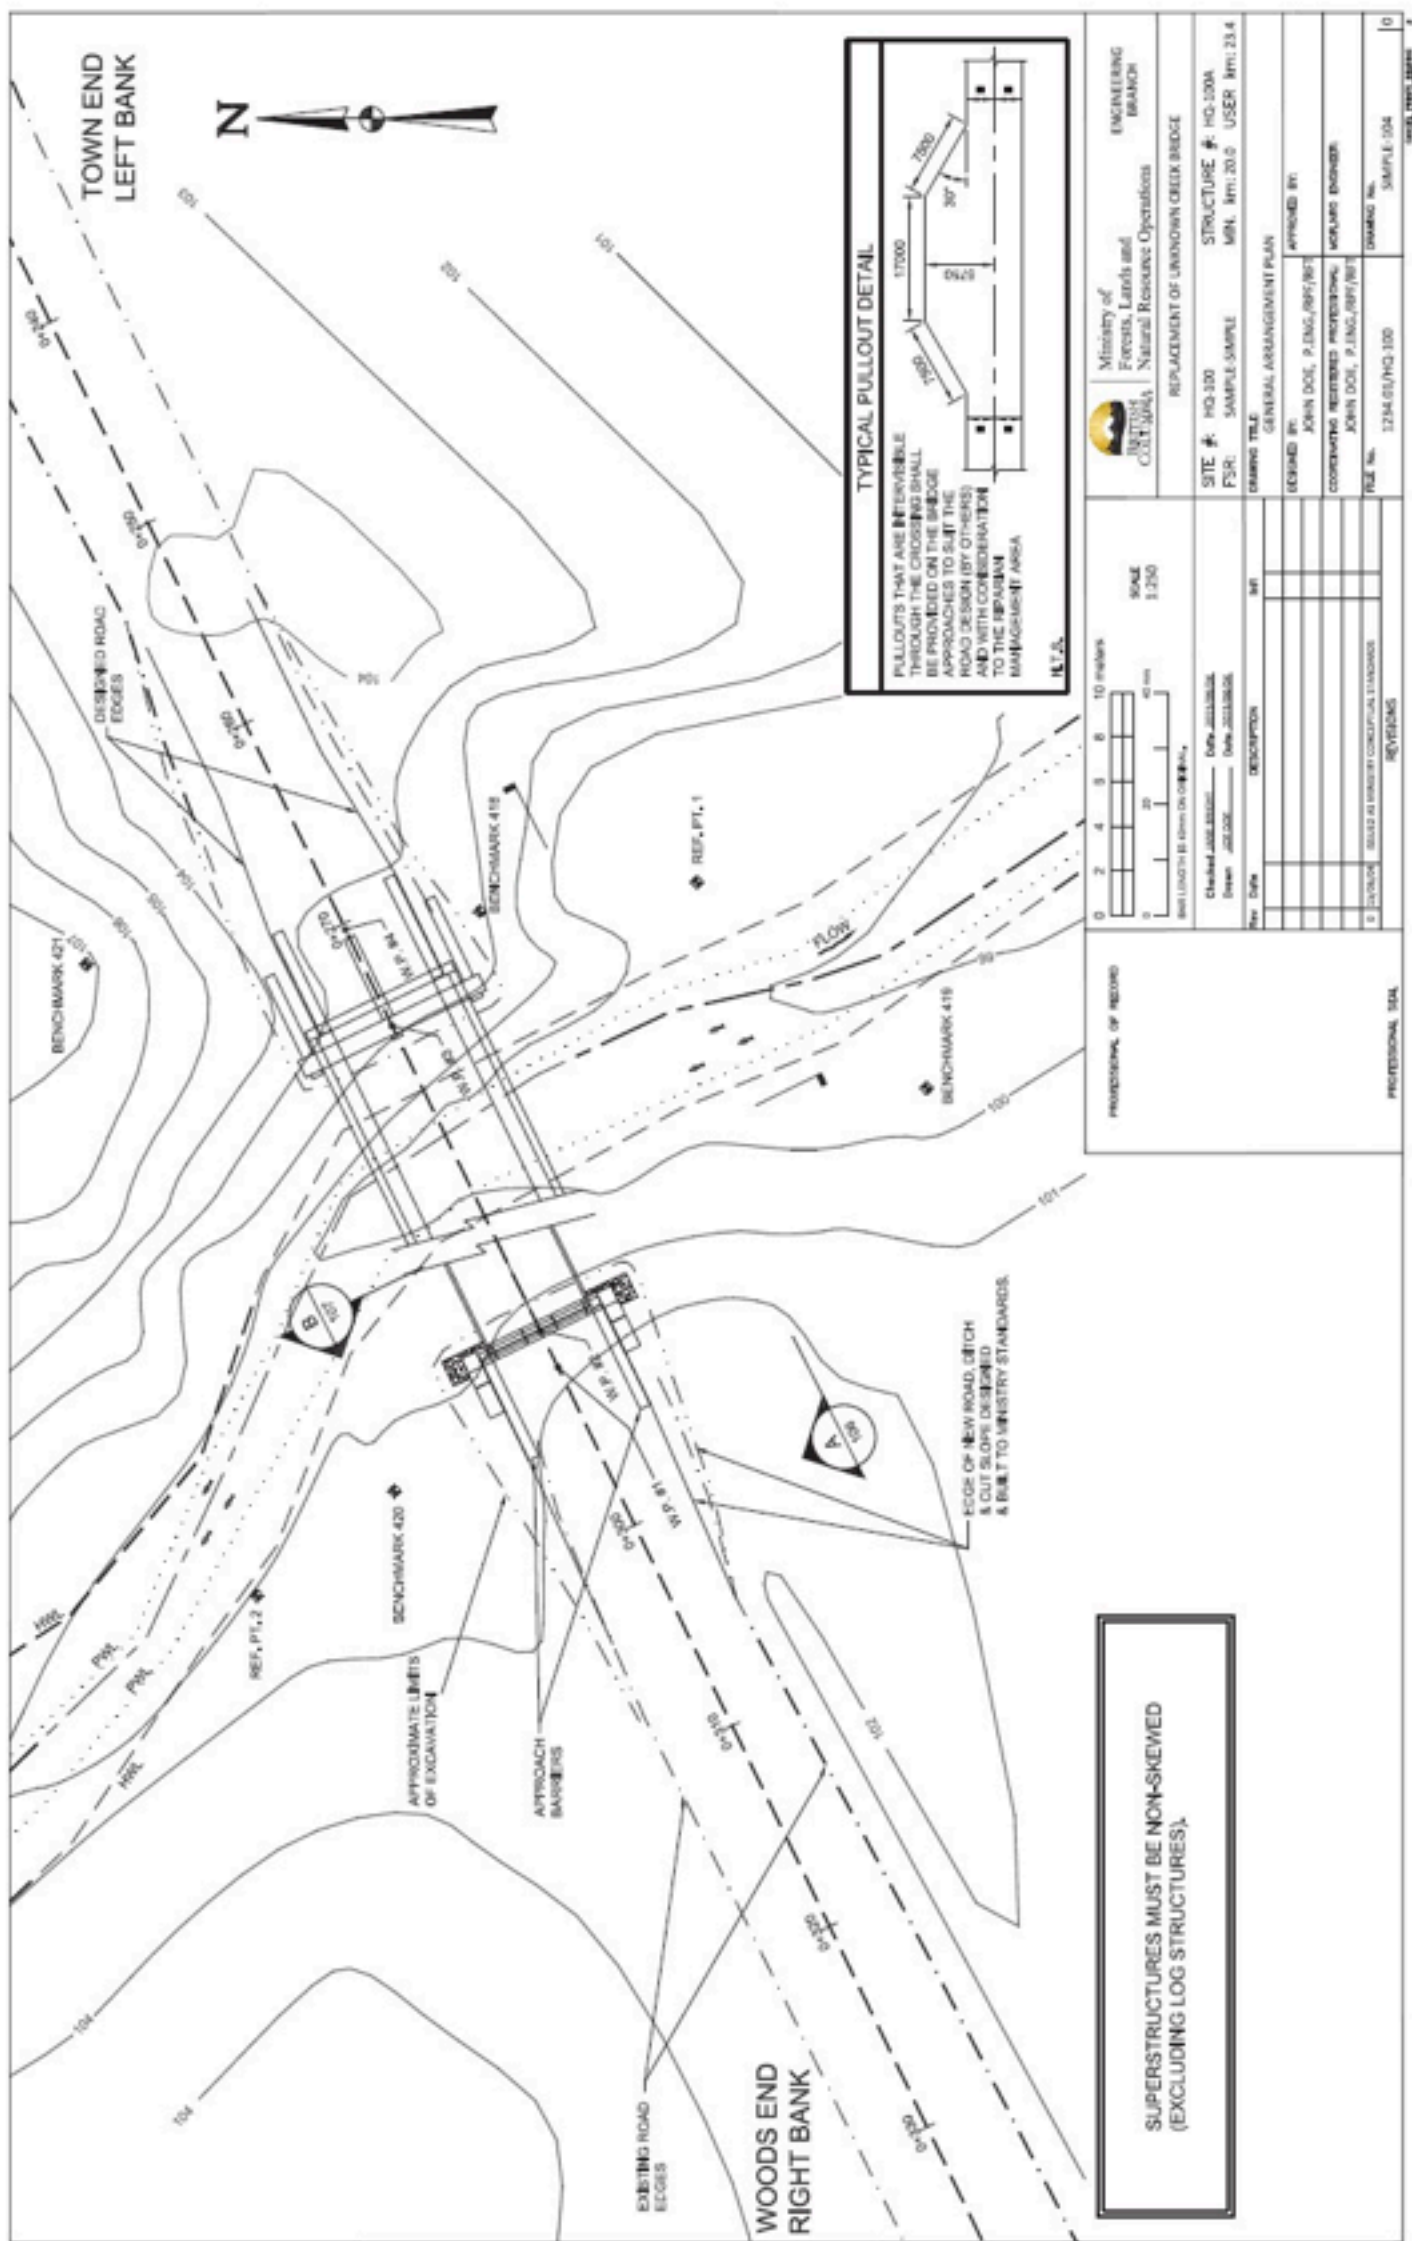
Sample of General Arrangement and Layout (complex creek crossing) (PDF, 2.2 MB)
